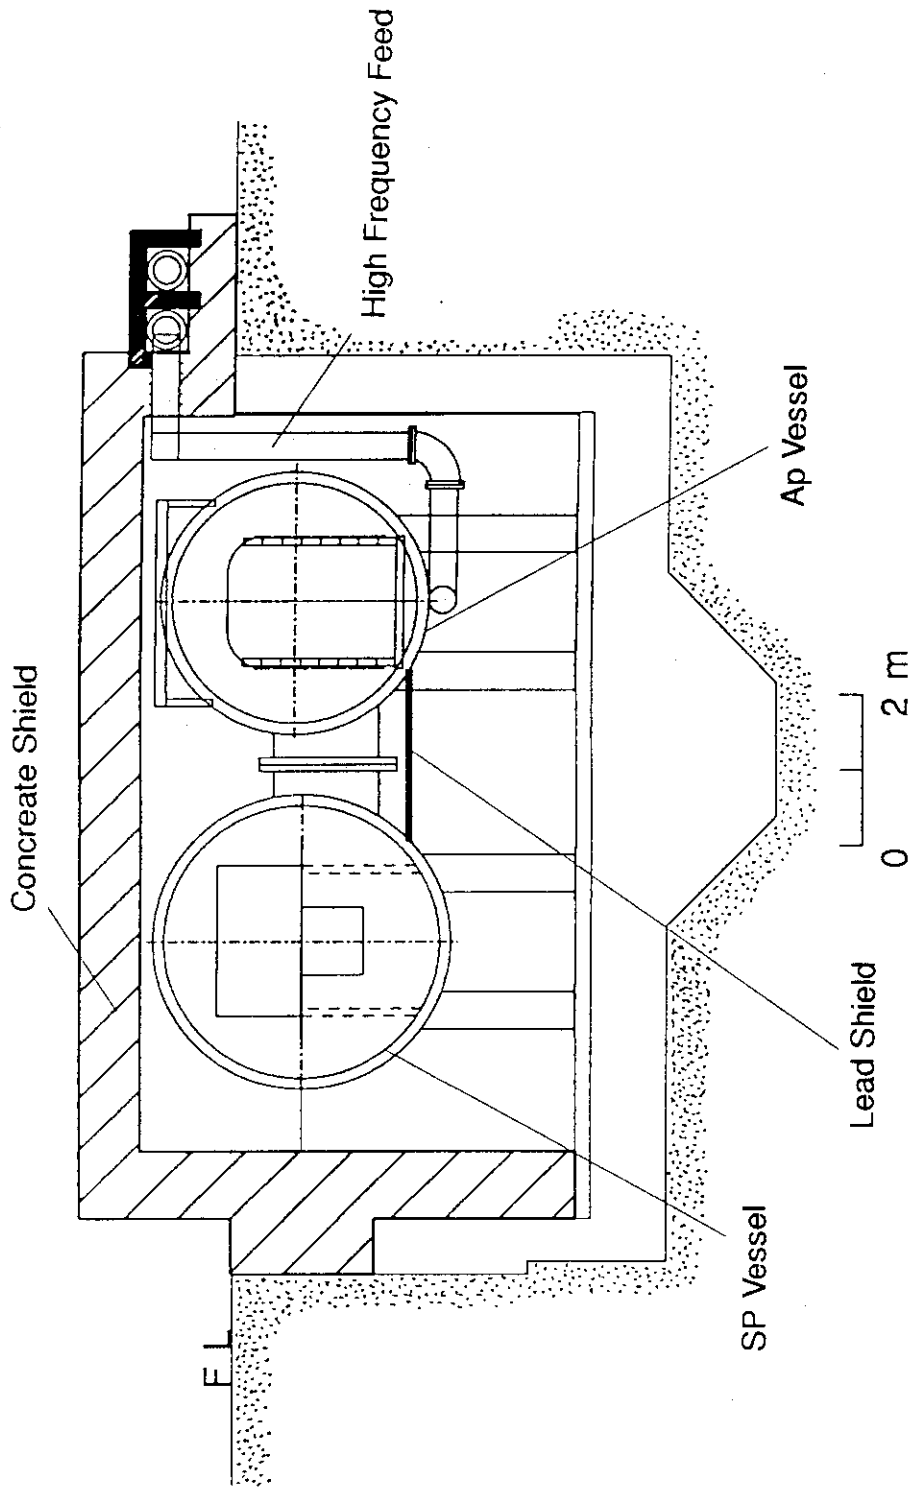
A cross-sectional view of MeV Test Facility.
